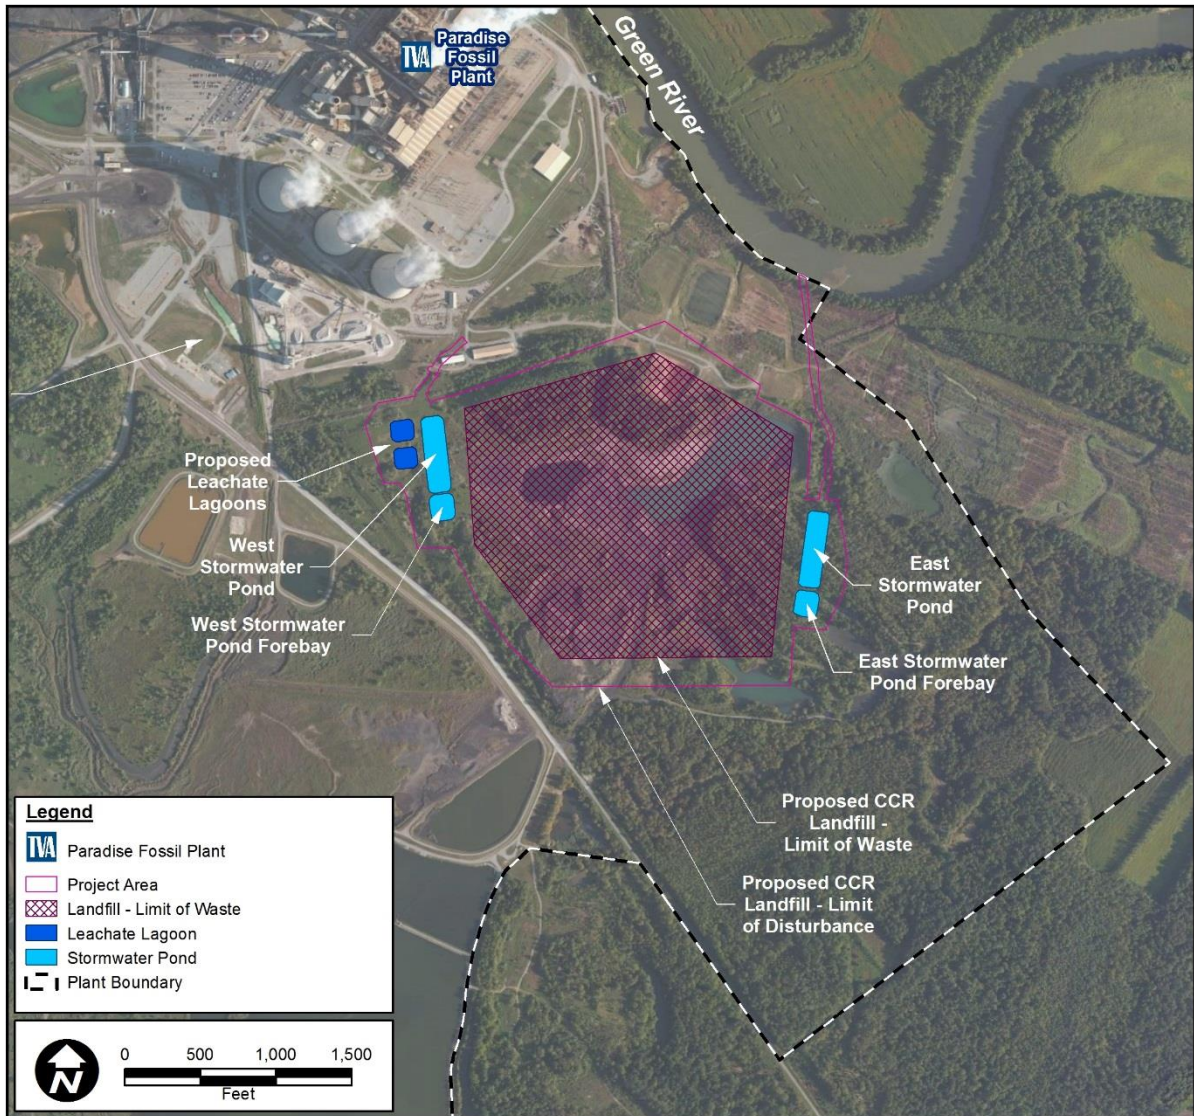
Project Features of Site 5 – Proposed Onsite Landfill
